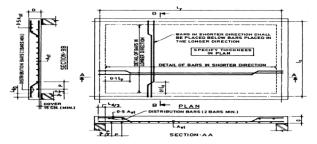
Reinforcement Details of slab for Earthquake Resistant structure
